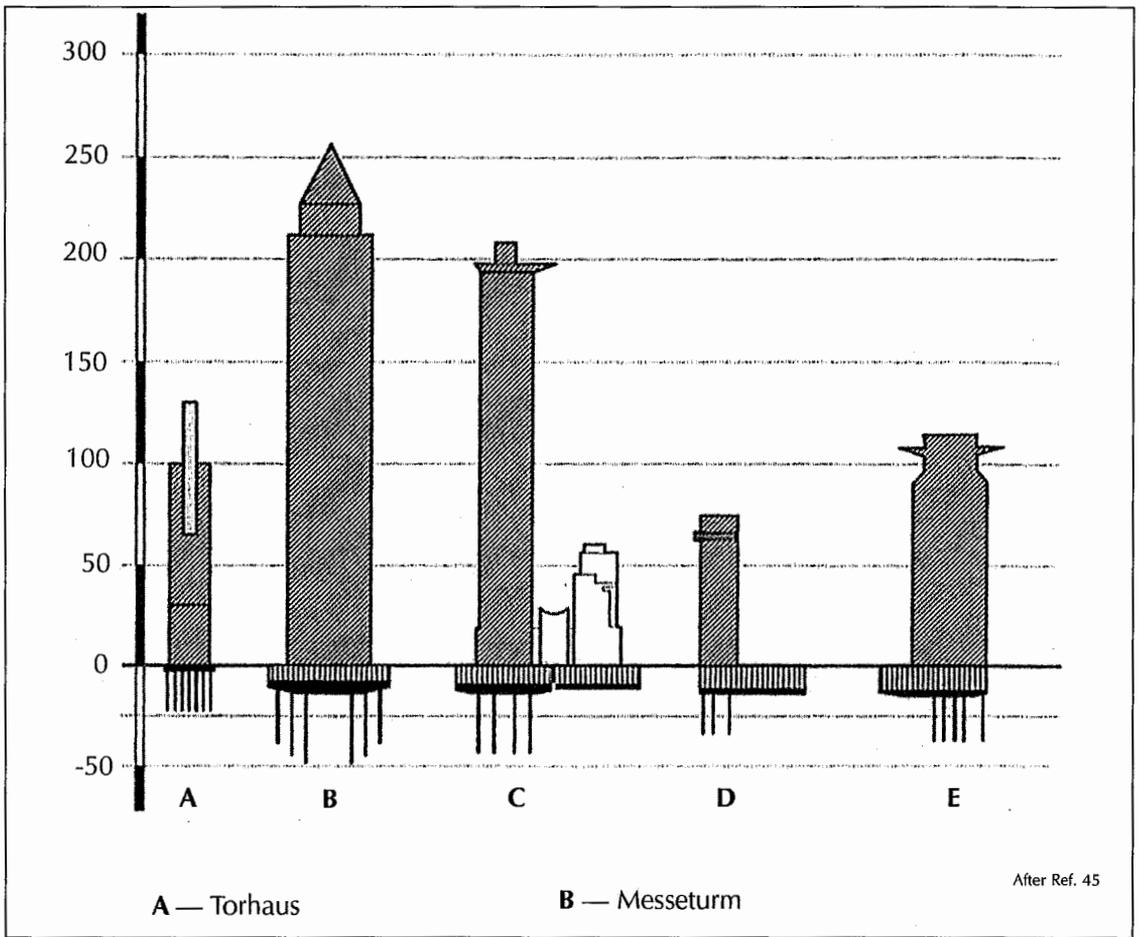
High-rise buildings in Frankfurt with piled raft foundations.
